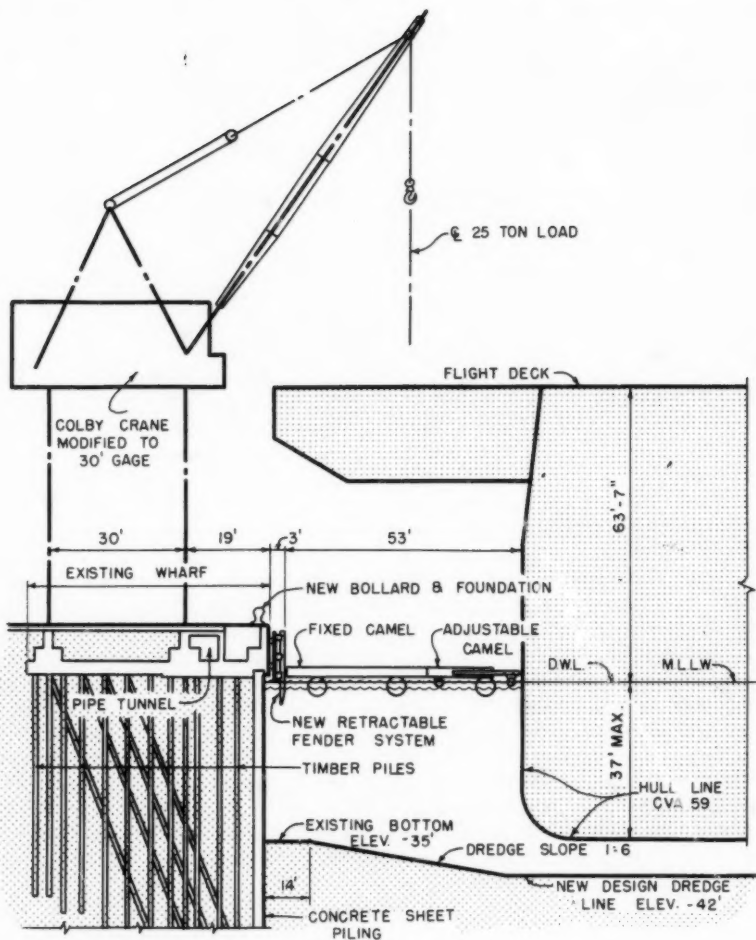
CROSS SECTION THROUGH EXISTING QUAY WALL AT THE NAVAL AIR STATION NORTH ISLAND
